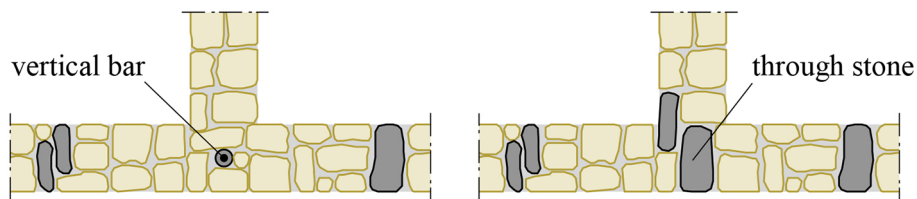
Conflicting rubble stone masonry details of a) T-section with vertical steel bar and b) T-section with through-stones (by courtesy of Smart Shelter Foundation).
